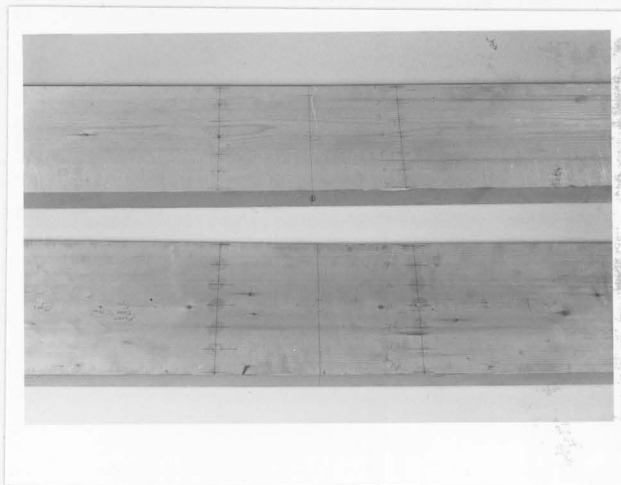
TYPICAL FAILURE IN 2 x 8 CLEAR BEAMS SUBJECTED TO THIRD-POINT LOADING
